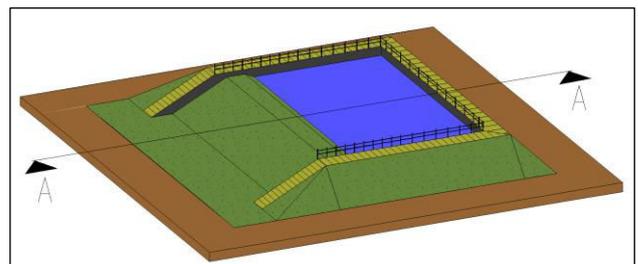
Layout of the planned large-scale test dike at the College of the German Federal Agency for Technical Relief in Hoya
